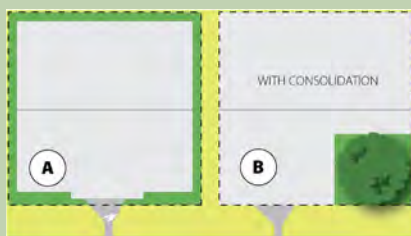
Properties A and B have the same amount of pervious area (shown in green); however, A has a narrow pervious edge surrounding the building that is too small for tree planting, and B shows the pervious area consolidated into a single location to support a tree. This illustrates how building setbacks and footprints can be adjusted to better accommodate tree planting.
